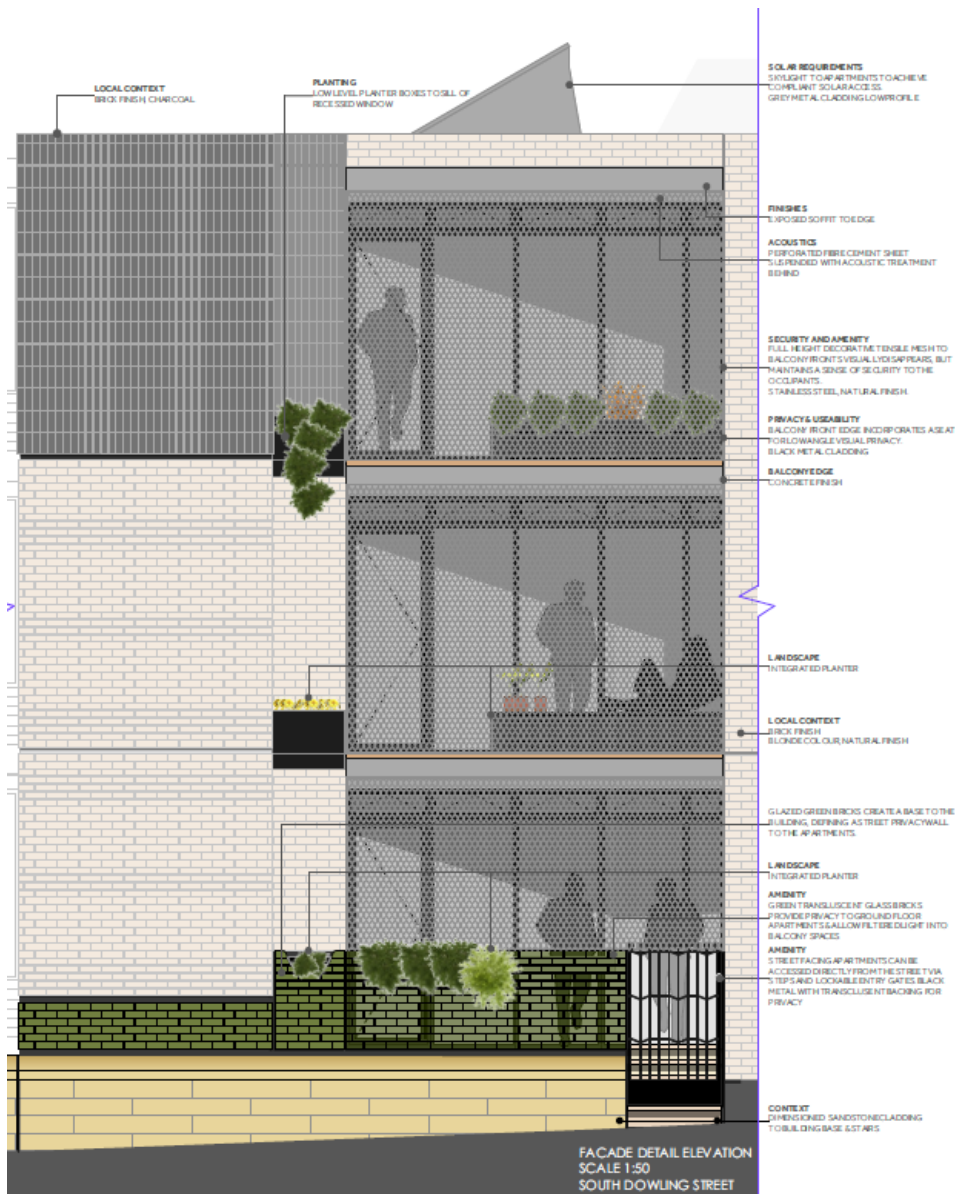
Proposed Facade Detail Plan - South Dowling Street
